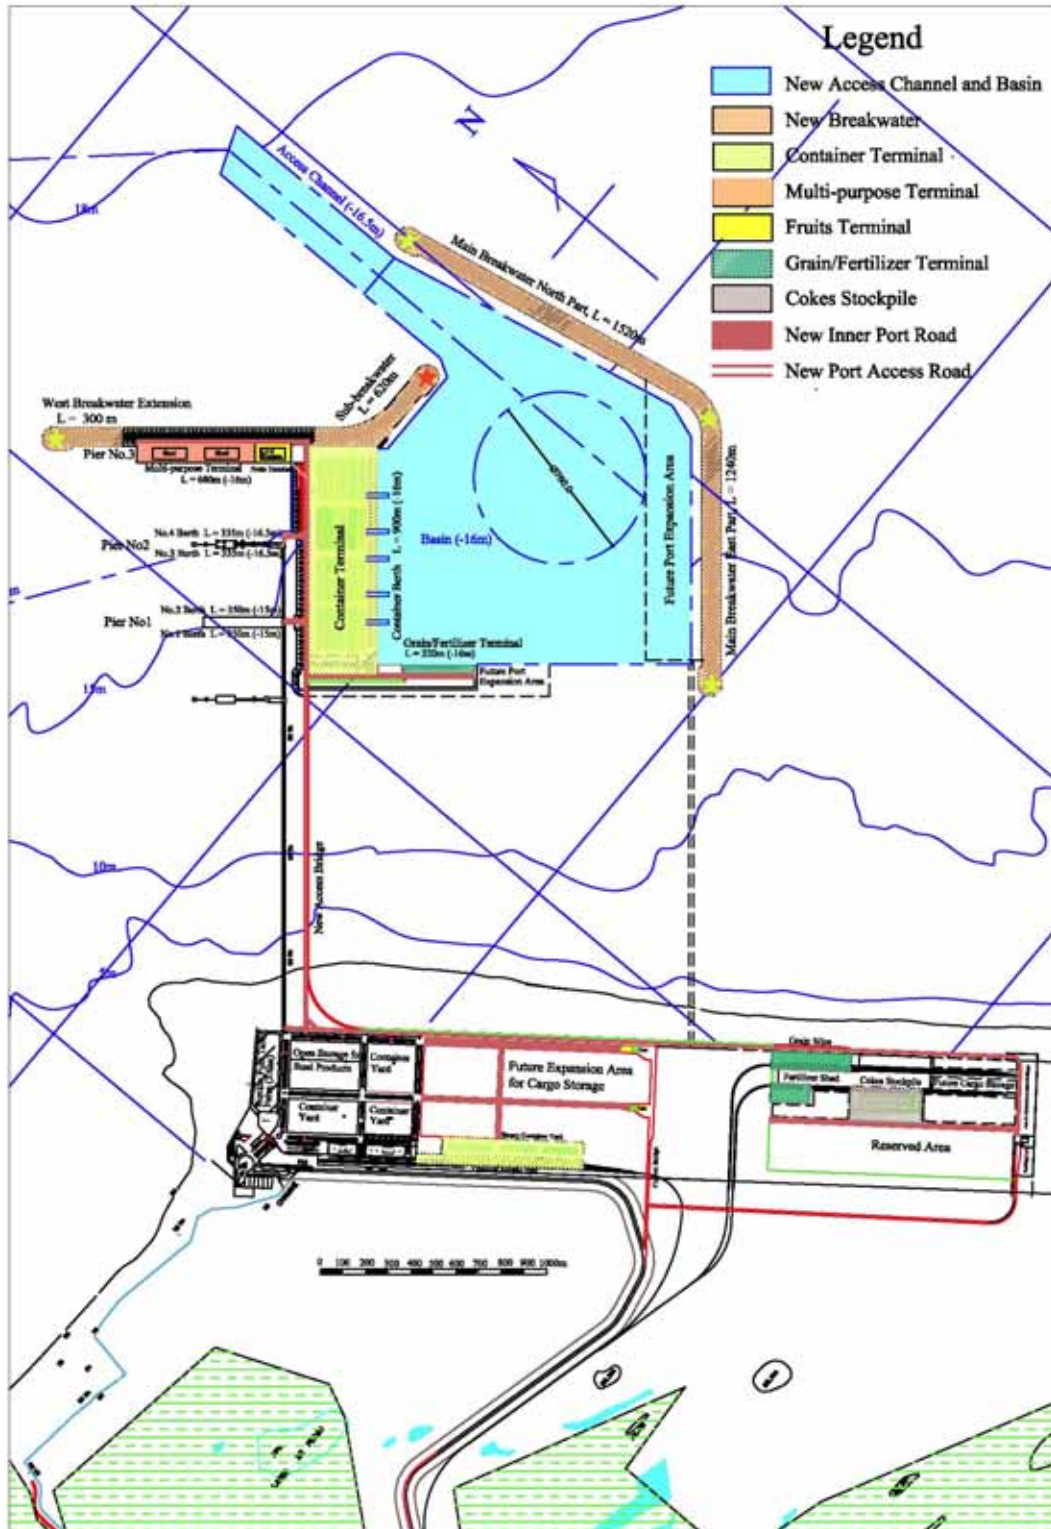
Facility Layout Plan of Pecem Port (Long-Term Development Plan)
